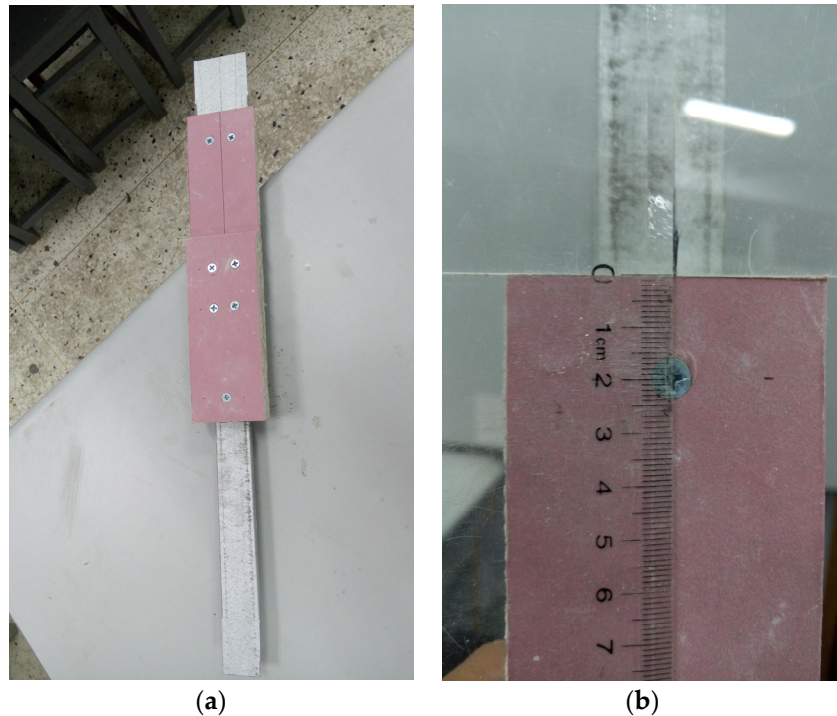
A typical screw connection specimen: (a) side view; and (b) verification of the loaded edge distance (20 mm).
